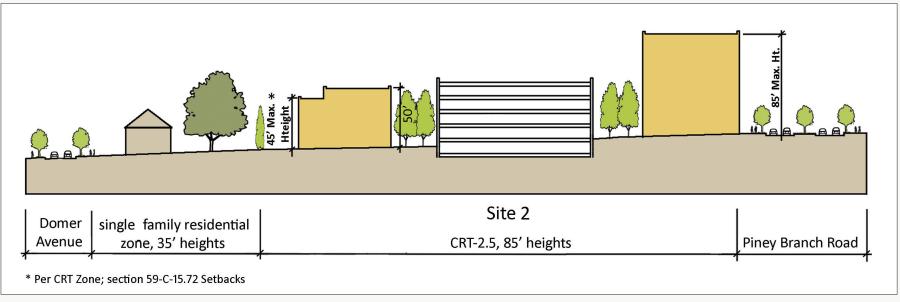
Site 2 Piney Branch Road and Domer Avenue
